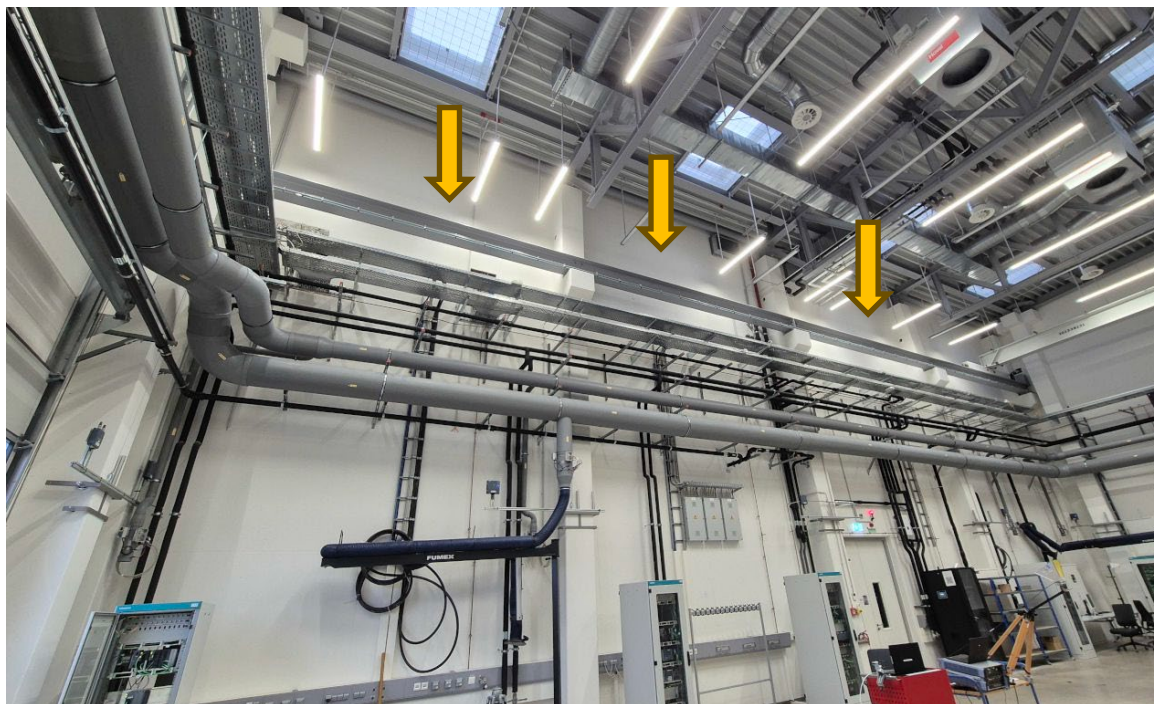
Installation of RCoax x cable in the test location; the yellow arrows point to place where the RCoax cable is installed
